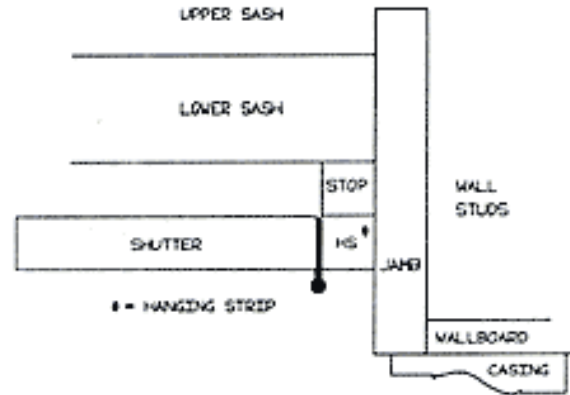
INSIDE MOUNT; SHUTTER WILL NOT FOLD BACK AGAINST CASING
